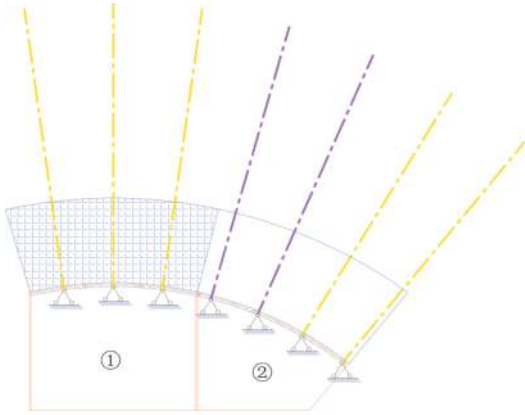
Span reduction effect of anchor cable in large span tunnel.
